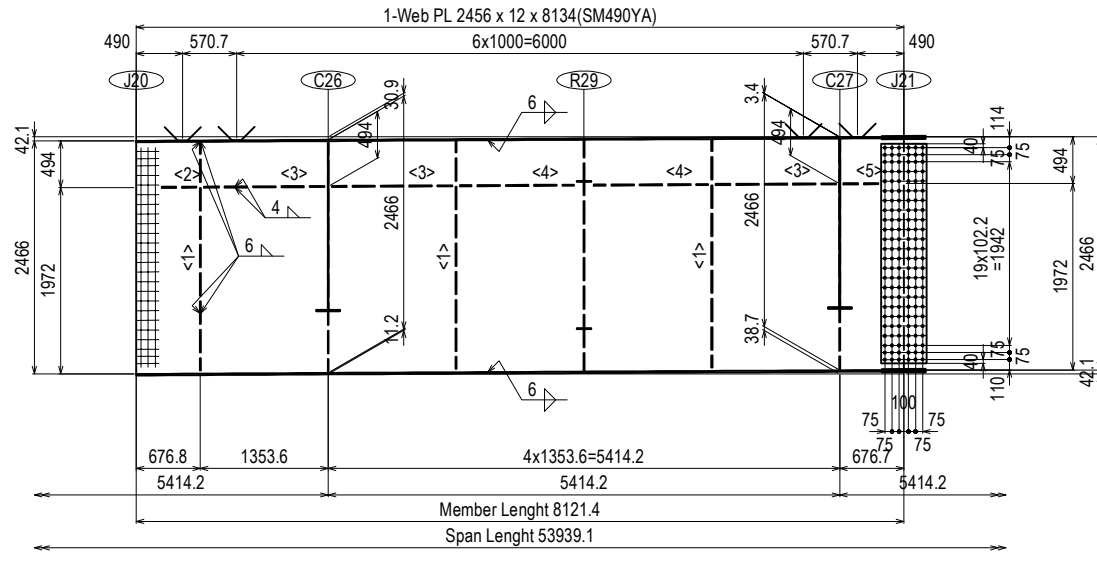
DETAIL OF MAIN GIRDER G1 (PF2-PF5) (21) S=1:80
